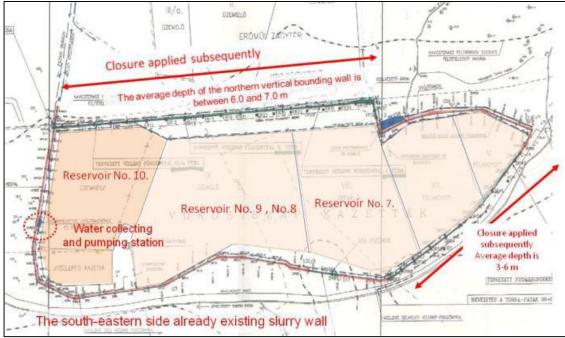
Site plan of the slurry wall and grout observed in the 1998 year (curtain boundary constructed at several stages)
